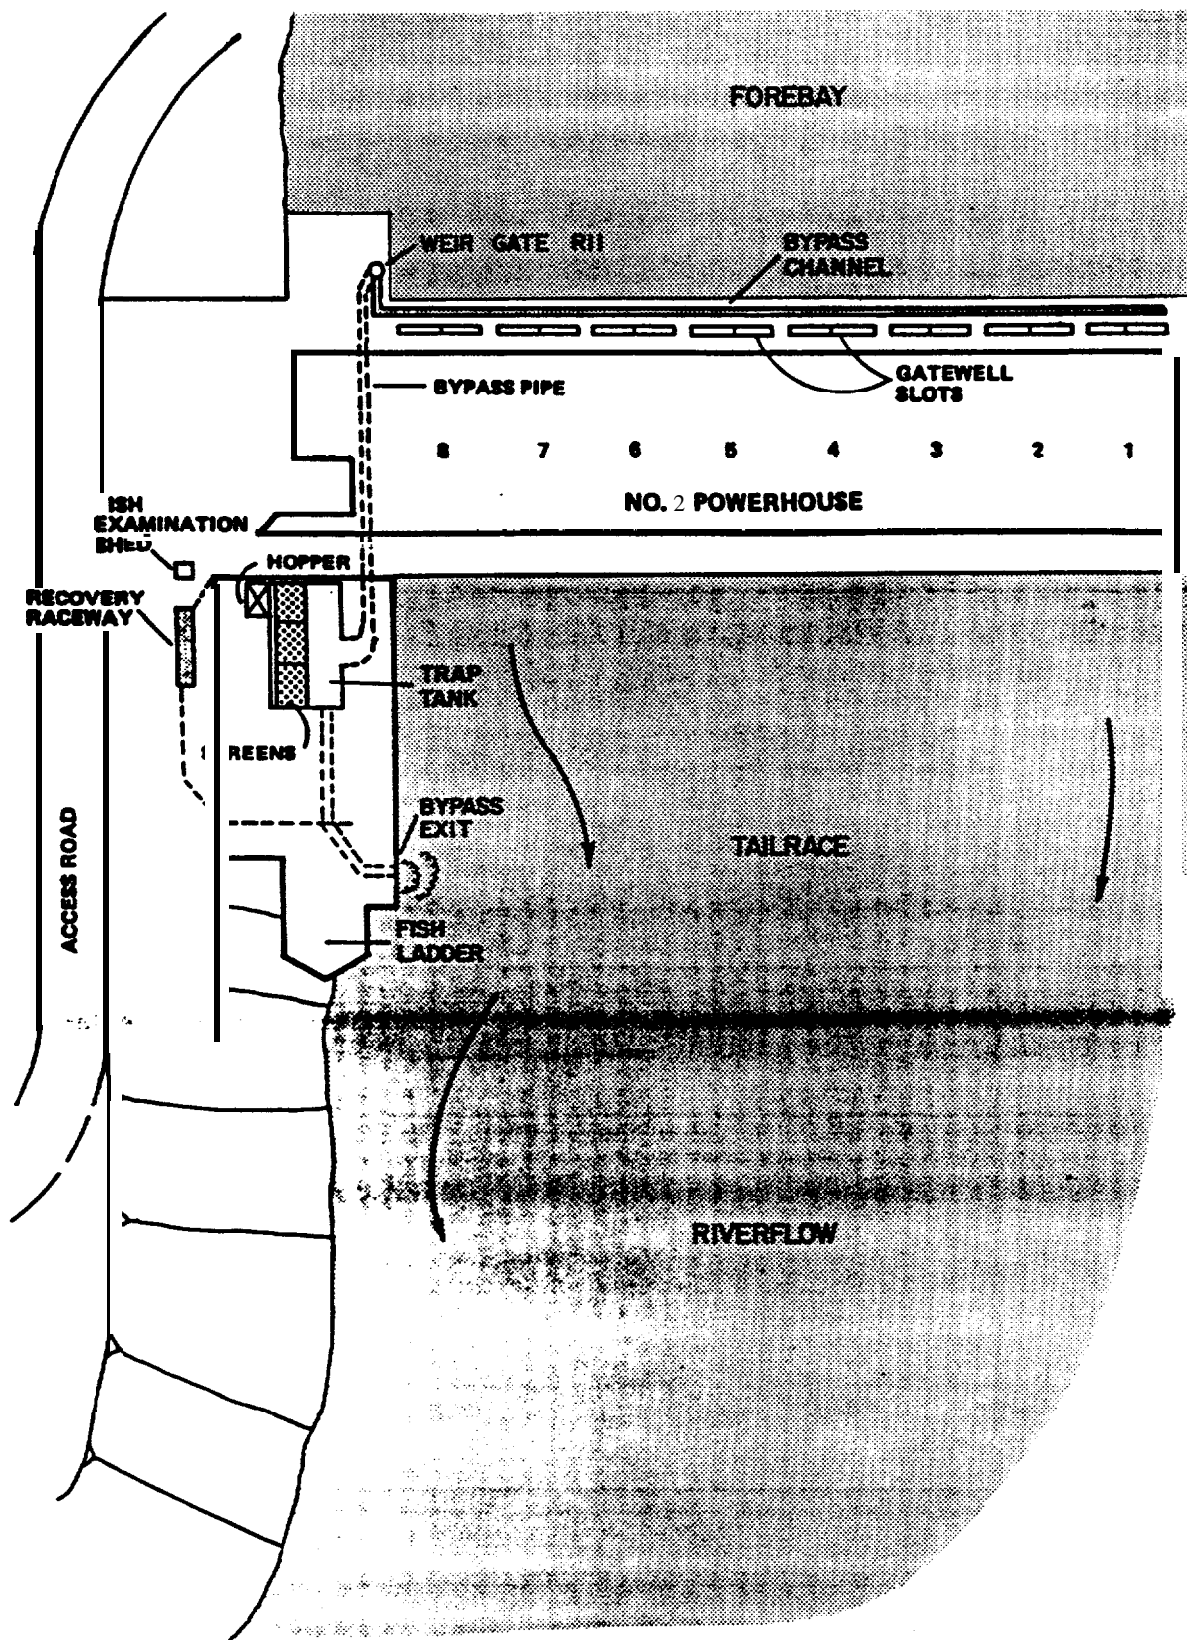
Plan view of juvenile salmonid bypass and collection system at Rock Island Dam second powerhouse (taken from Olson 1983).
